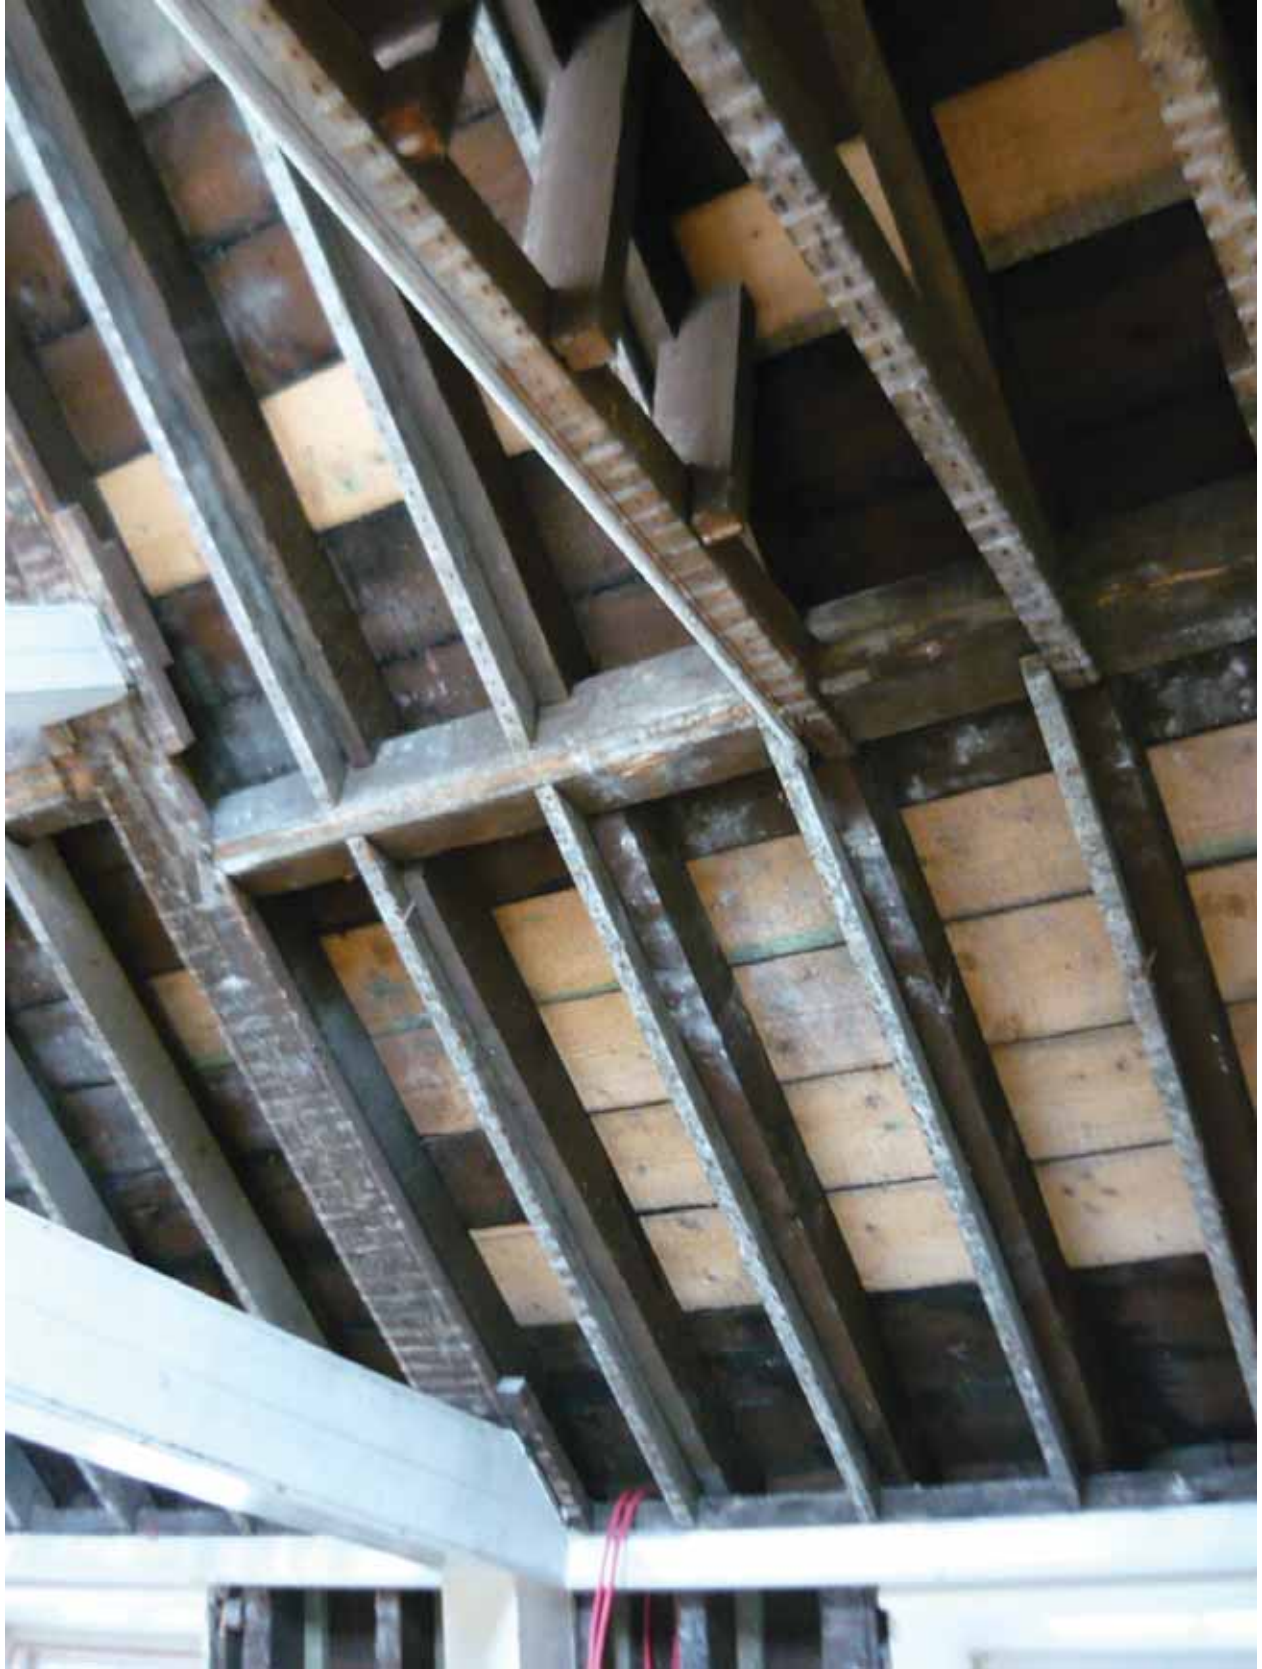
East side of the roof above Room T17, looking north-east (EAF10 BHD10 (24))
